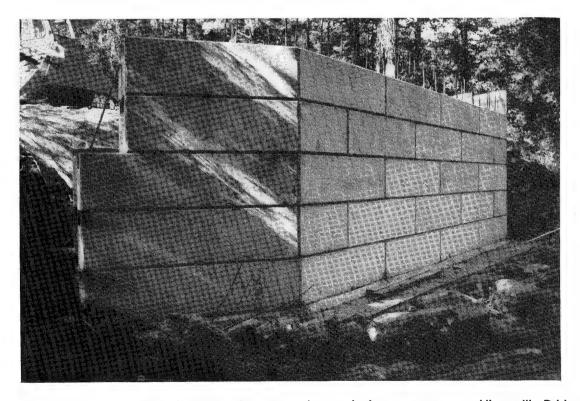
Front view of precast abutment prior to placing concrete cap, Ulsterville Bridge
